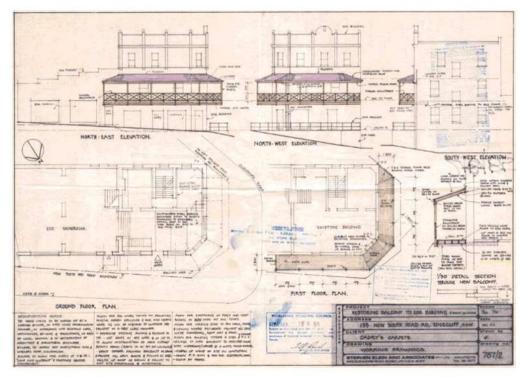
BA1985/218 which approved reinstatement of the first floor level cantilevered balcony. Architect: Stephen Klein and Associates. These works were not carried out. (Source: Woollahra Council)
